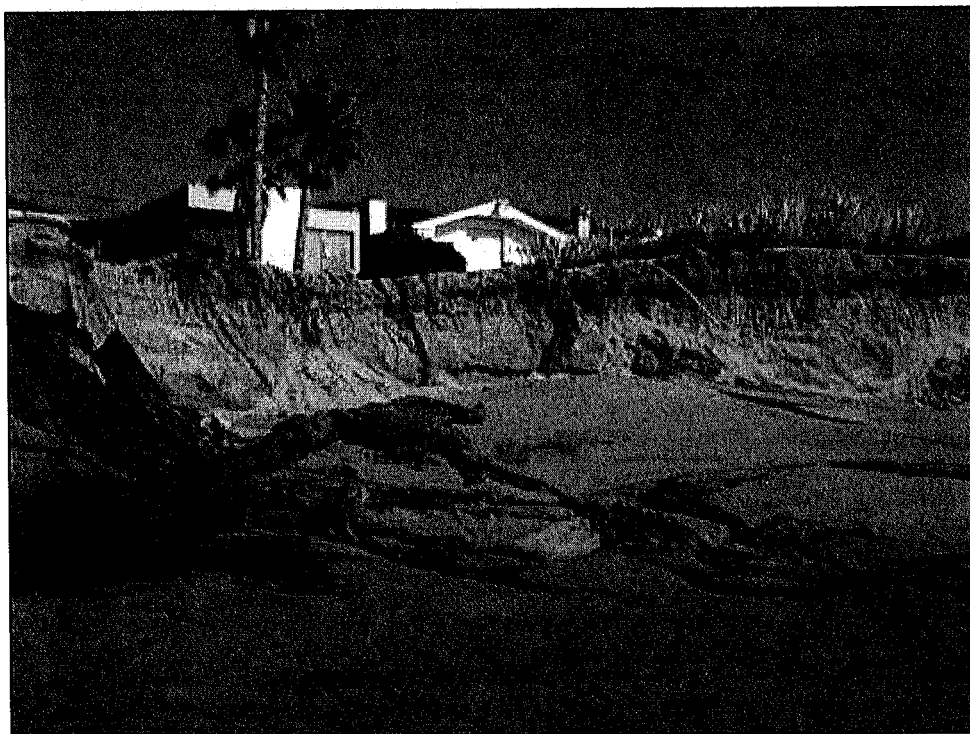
Temporary Sandbag Revetment Failure and Dune Damage (January 2010)
